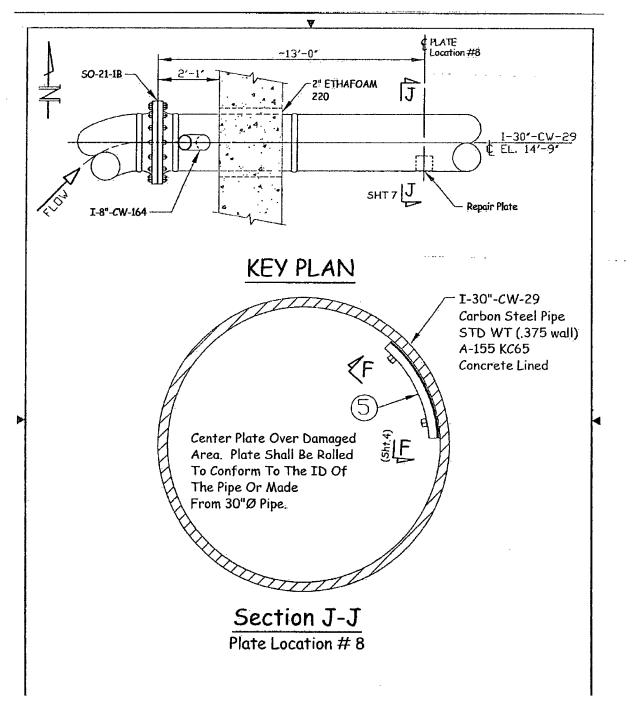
Typical Bolted Patch Plate Drawing Key Plan and Section J-J View
